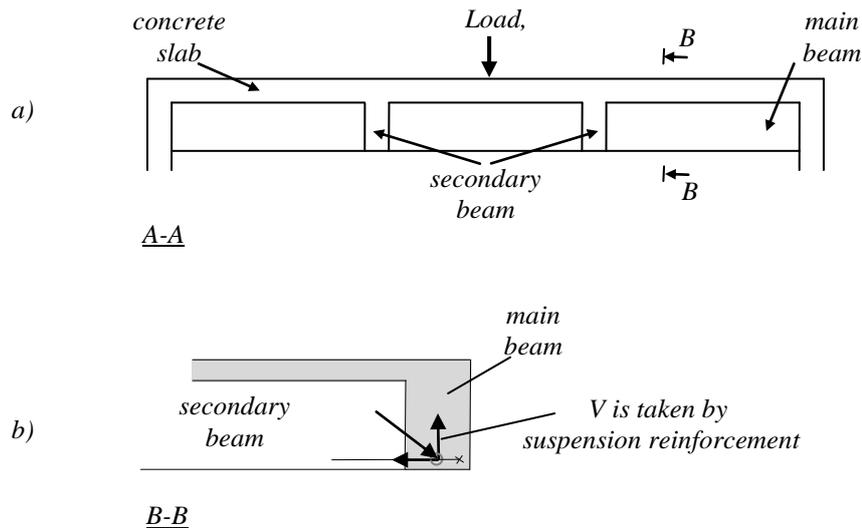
Example of a case where load is applied at the bottom of a beam, a) section of the main beam loaded by two secondary beams, b) schematical view of connection where the load should be presumed to act on the main beam. The figure is based on Boverket (2004).
